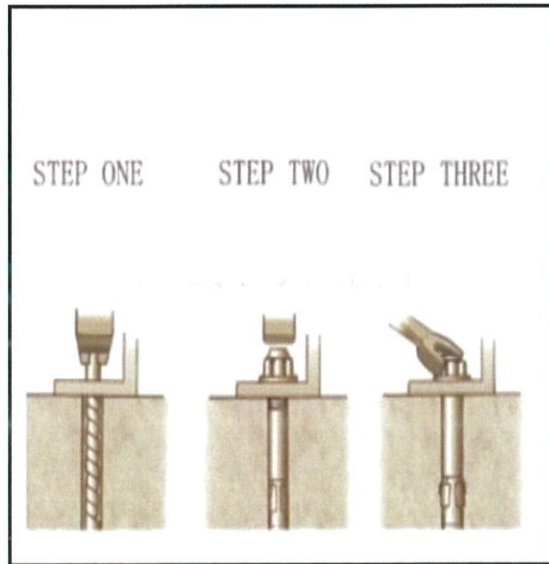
Drilling and installing (source: Tetuan Yeo Plumber Sdn Bhd)
